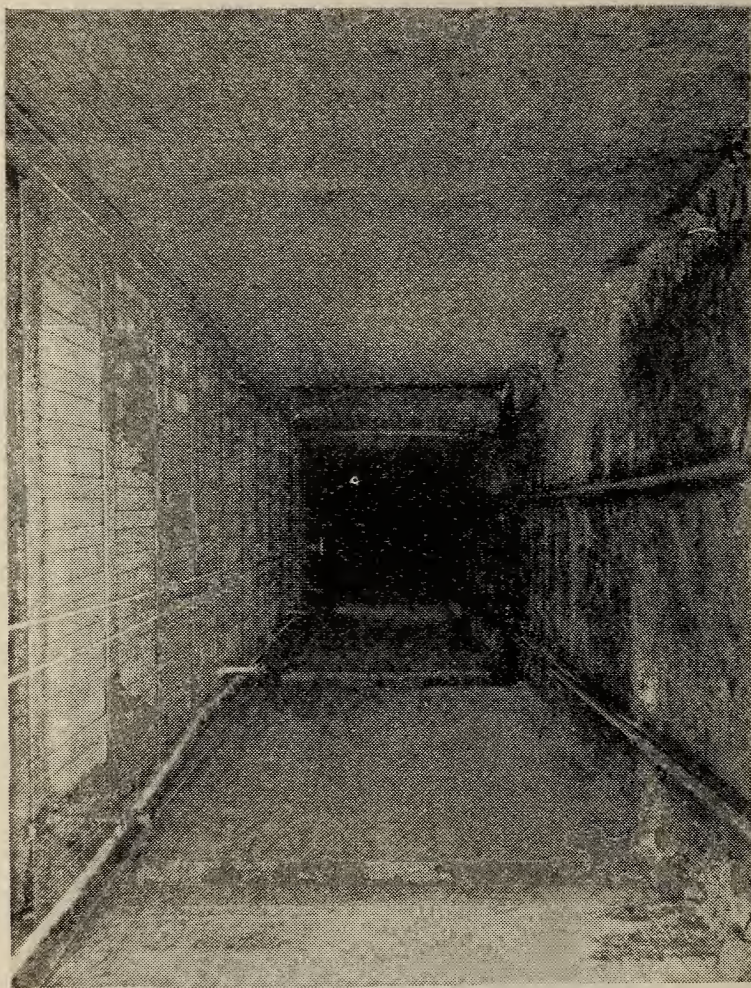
Good track and well-supported roof and sides are essential to safe mine haulage.
